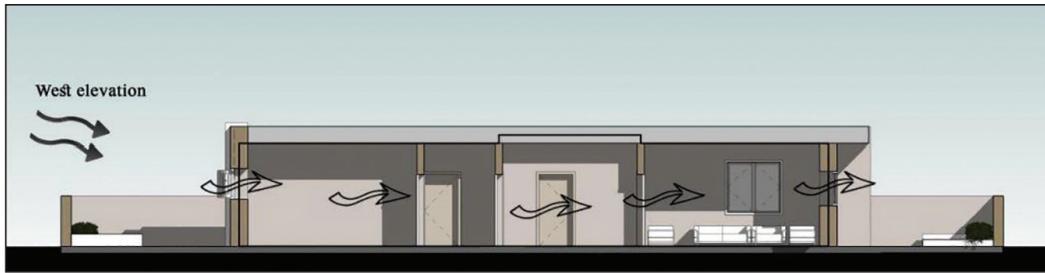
Clarification of natural ventilation through a vertical section of the building
